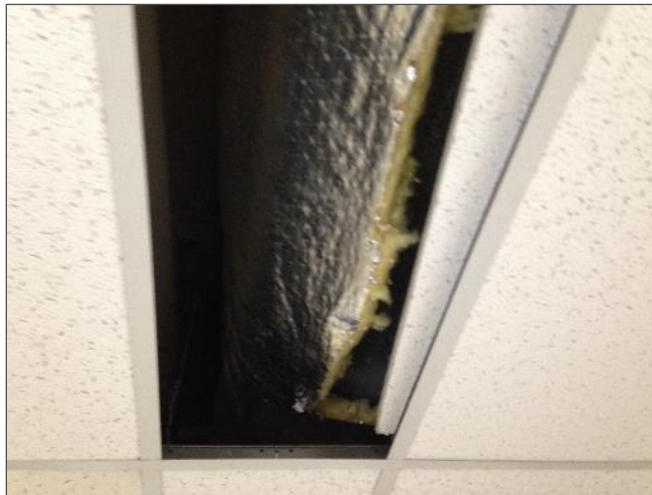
Ducts insulated with non-asbestos containing fiberglass insulation, Hallway (Location 117).
